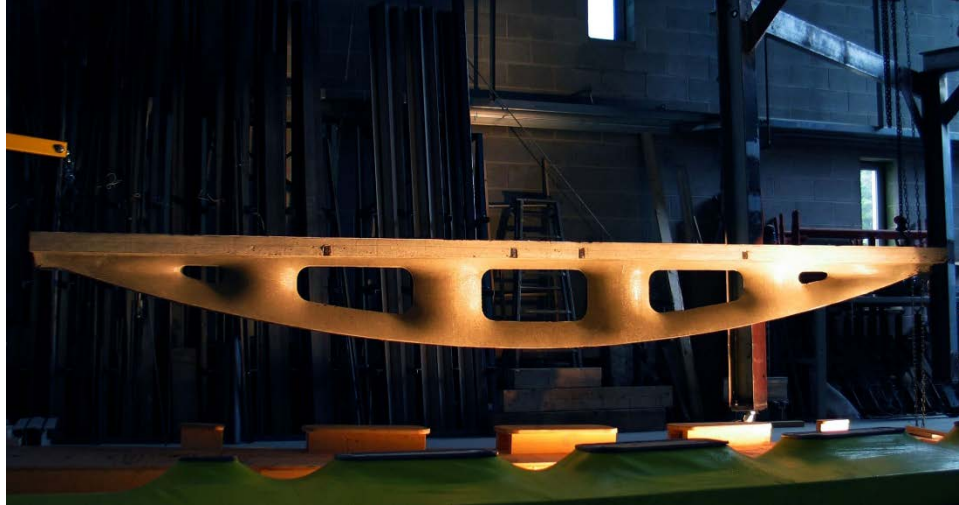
Concrete truss built using flexible fabric formwork, University of Manitoba
